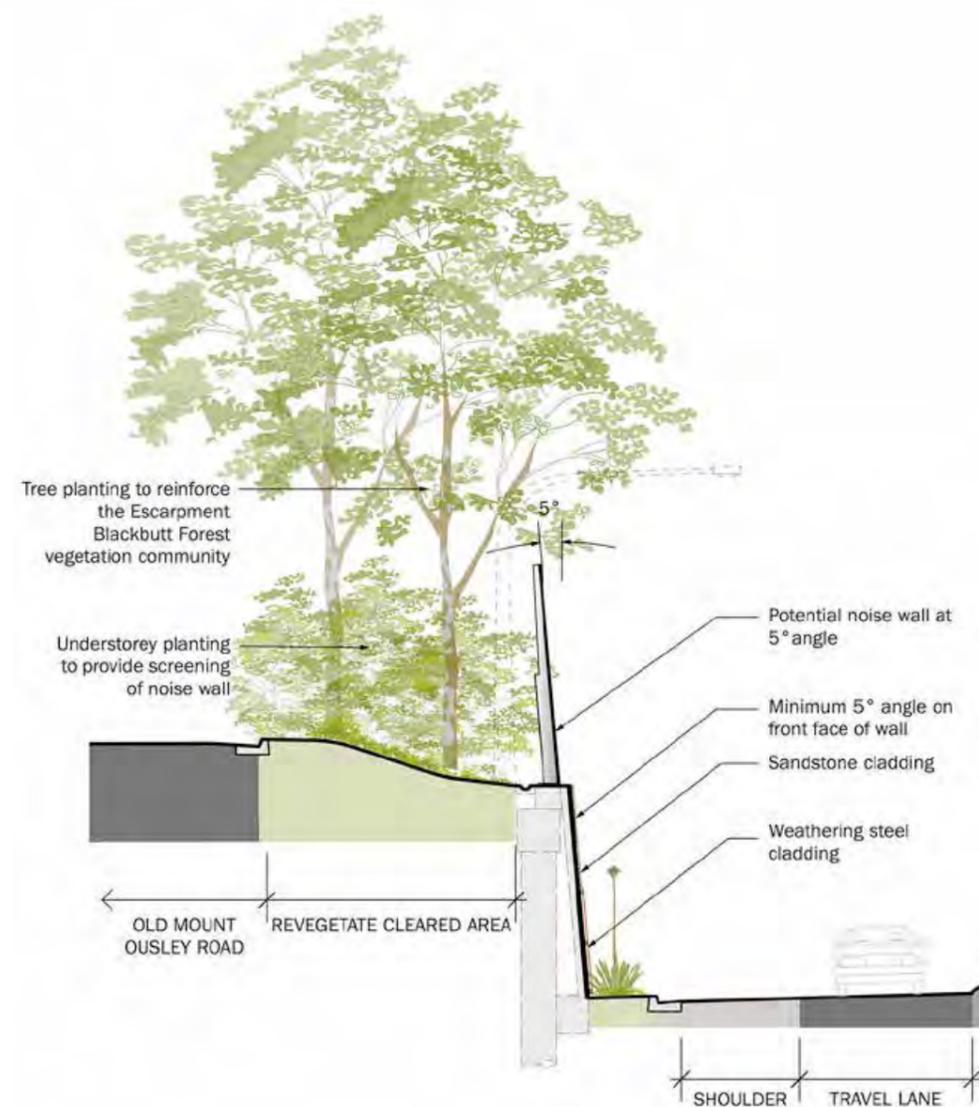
Typical section of noise wall - Finish type NW-F1 (Scale 1:150)
